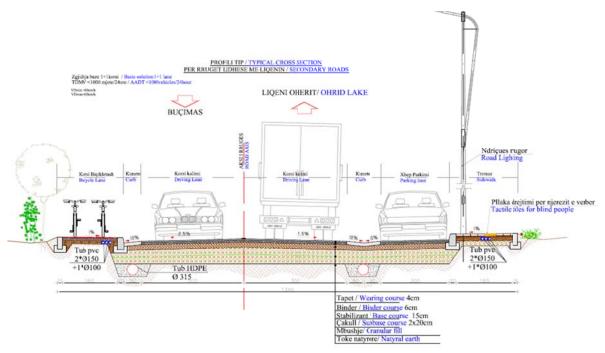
Typical cross-section of secondary roads connecting the main road with the lake front
